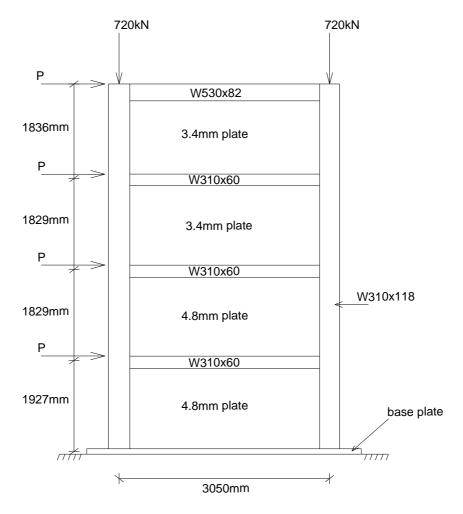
Details of Specimen Tested by Driver et al. (1998)
